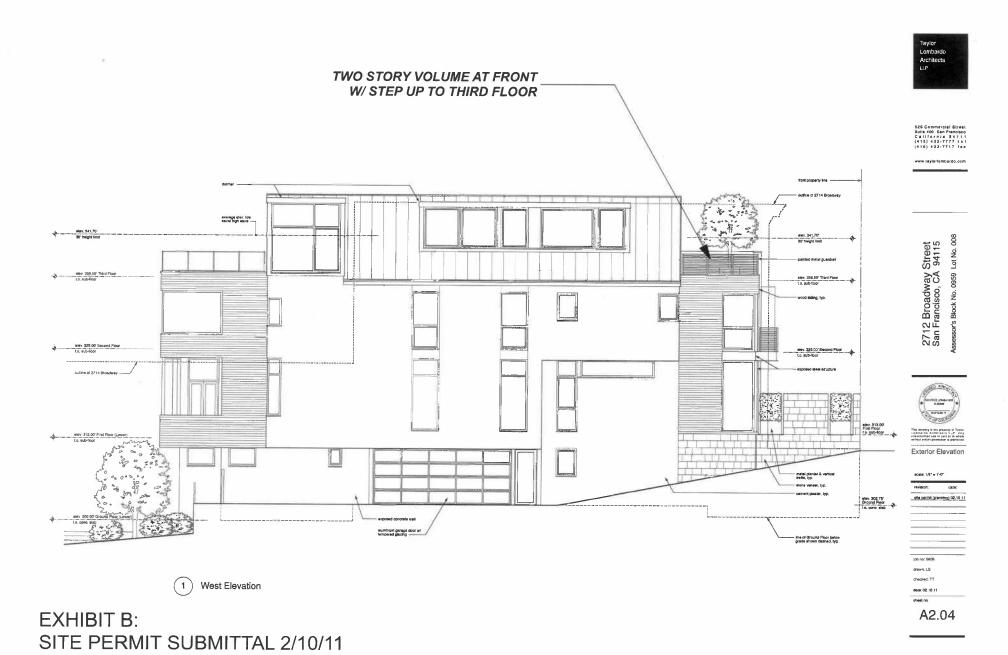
EXHIBIT B: SITE PERMIT SUBMITTAL 2/10/11
